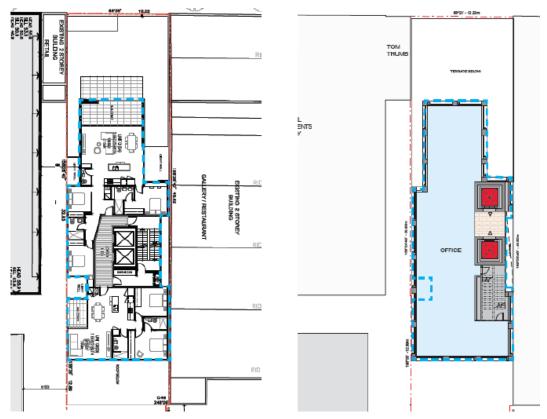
Approved and proposed typical tower floor plans - Flinders Lane building (source: application plans by Bates Smart)
